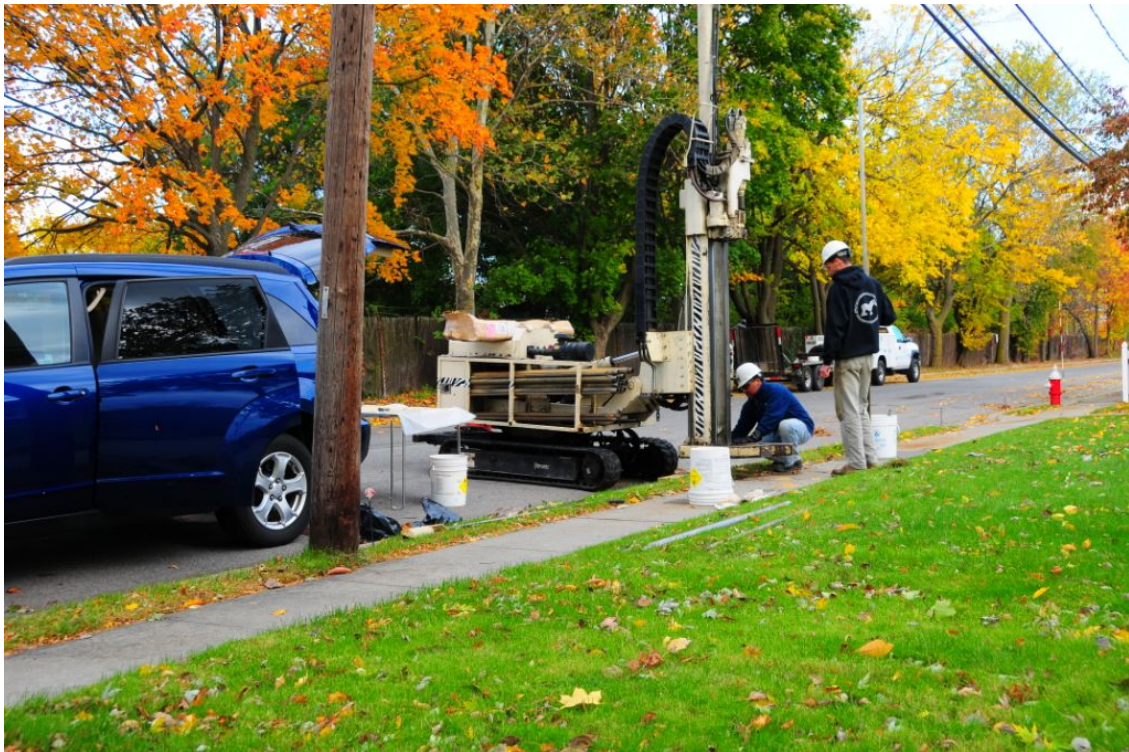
Looking NW at DPT rig positioned at BPSI-SG2002.
